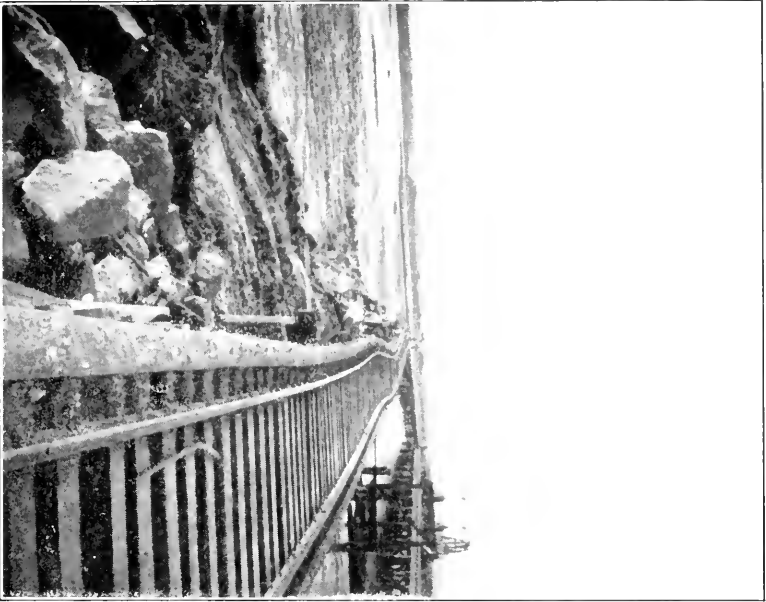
KINK IN LOWER TRESTLE CAUSED BY DEFT BREACHING
